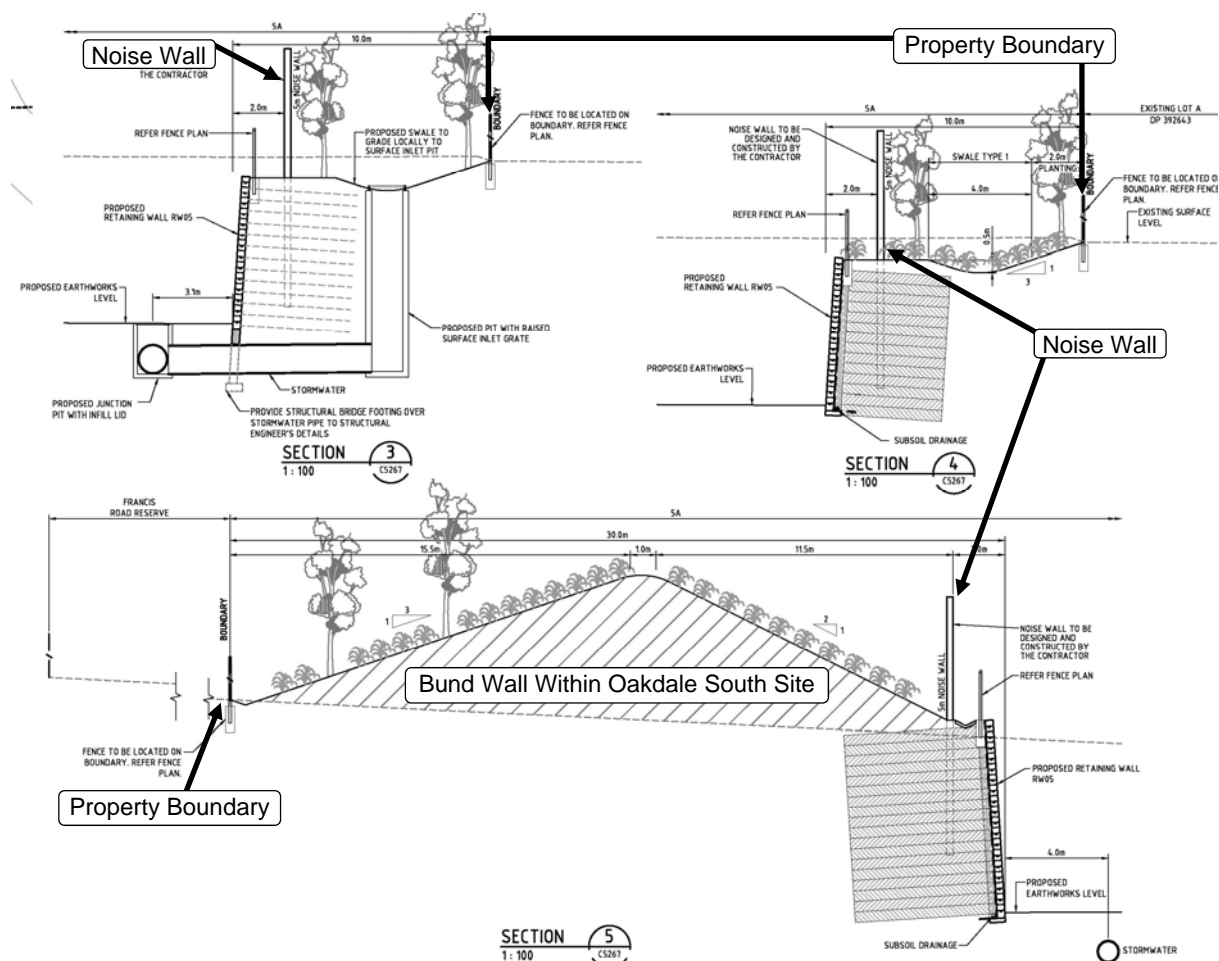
Southern (Bottom) and Eastern (top) Noise Walls and Setback Sections
